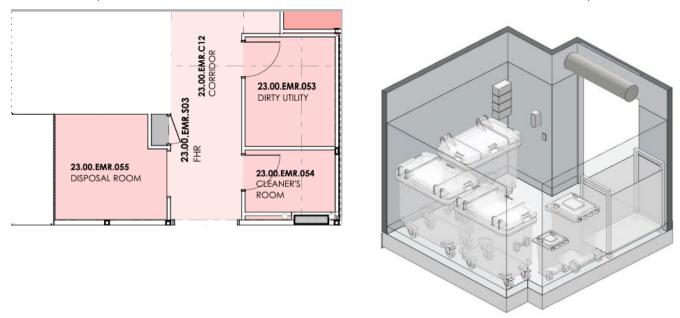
(L) Example of department layout of dirty utility and disposal room, (R) Example layout of disposal room
